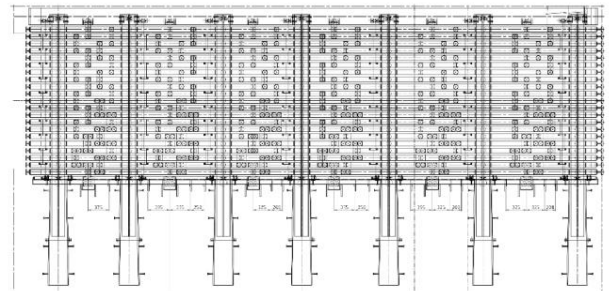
Plan view of 22gap joint with mageba elastic control system (Nanjing).
